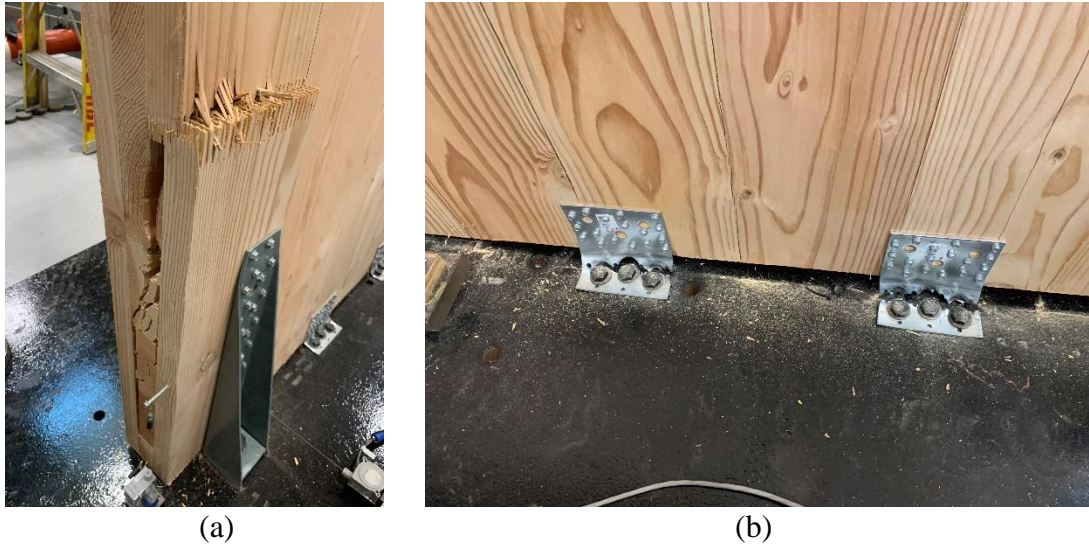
Failure of Foundation Connections During Test B2
